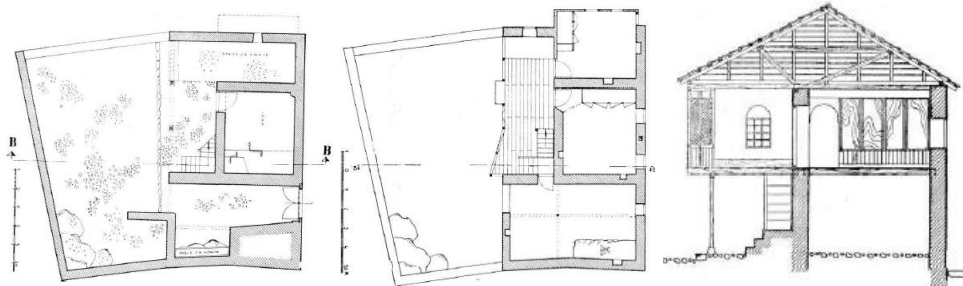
Ground, first floor plan, and section of a residential building in Pocitelj (Celic, 1959: 38-39)
